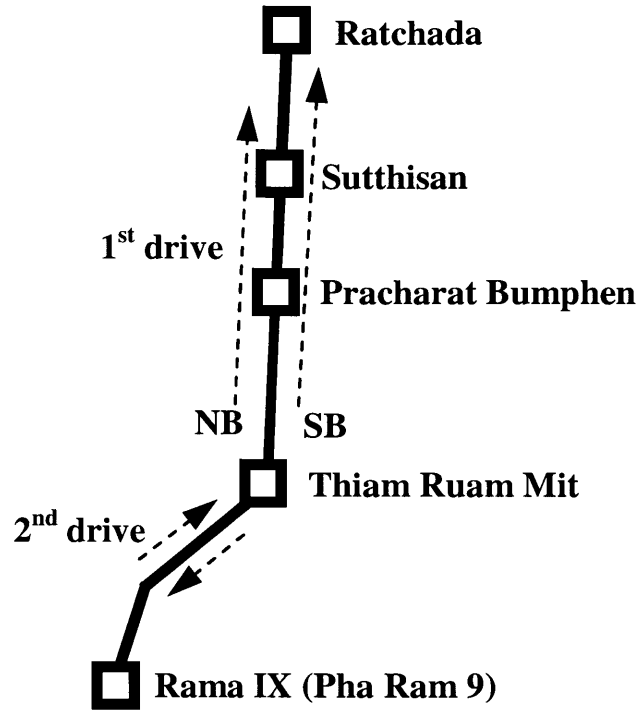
Tunnel drive sequence of Section A (North Section)
